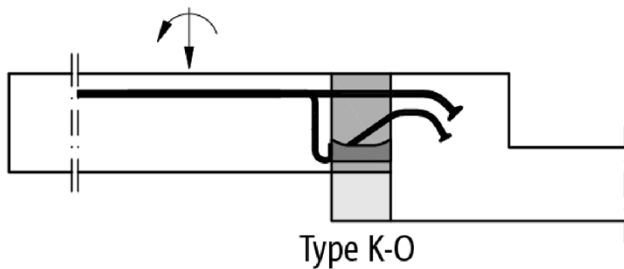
Schöck Isokorb® Type K-O, K-O-F for freely cantilevered balconies with or without height offset upwards or wall connection
